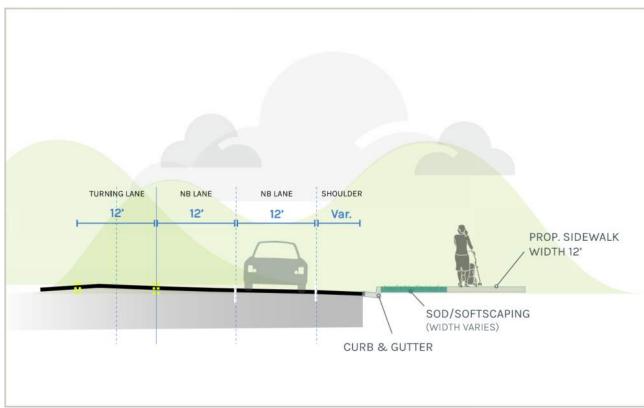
\mid Typical Section - Proposed Condition with Curb and Gutter
